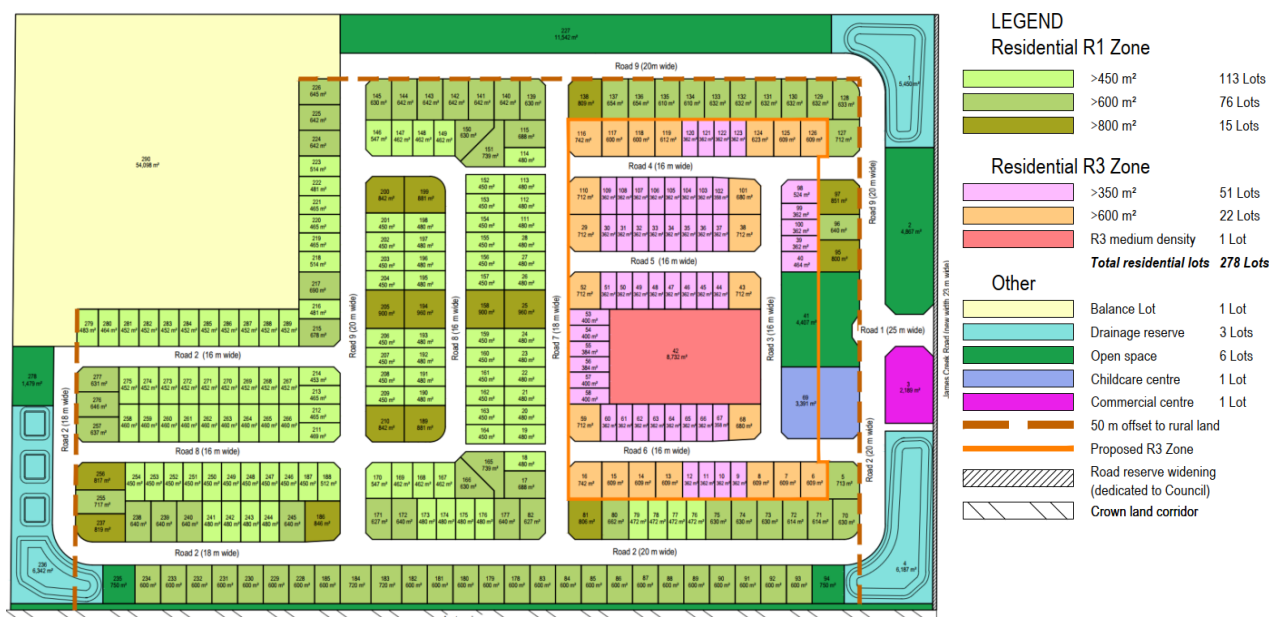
Proposed (Revision F) Subdivision Plan (Source: Geolink)
